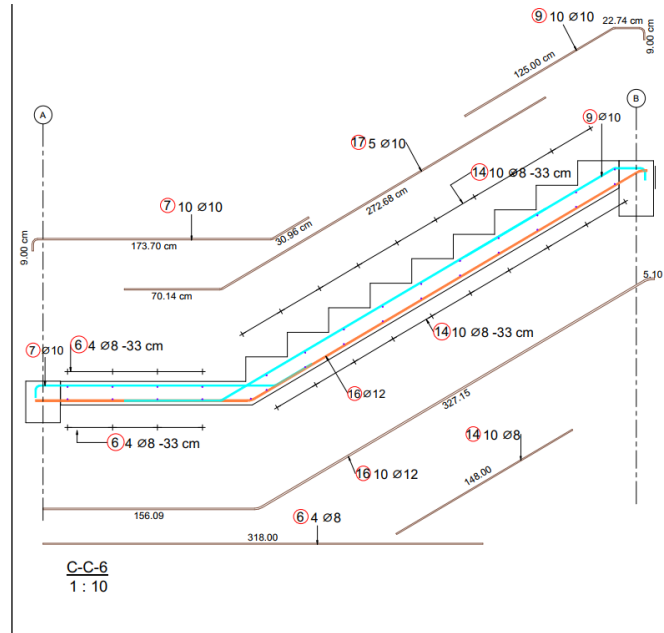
63. Longitudinal cross-section of the staircase at section C-6
